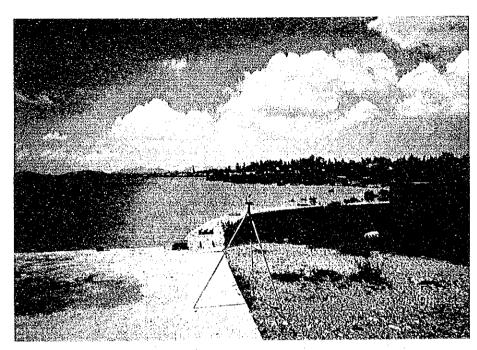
Present River Bank of Dinh River in front of the Project Site "Cat Lo" View from downstream side to upstream side (photo taken at nearly high water level approx. 350cm)
